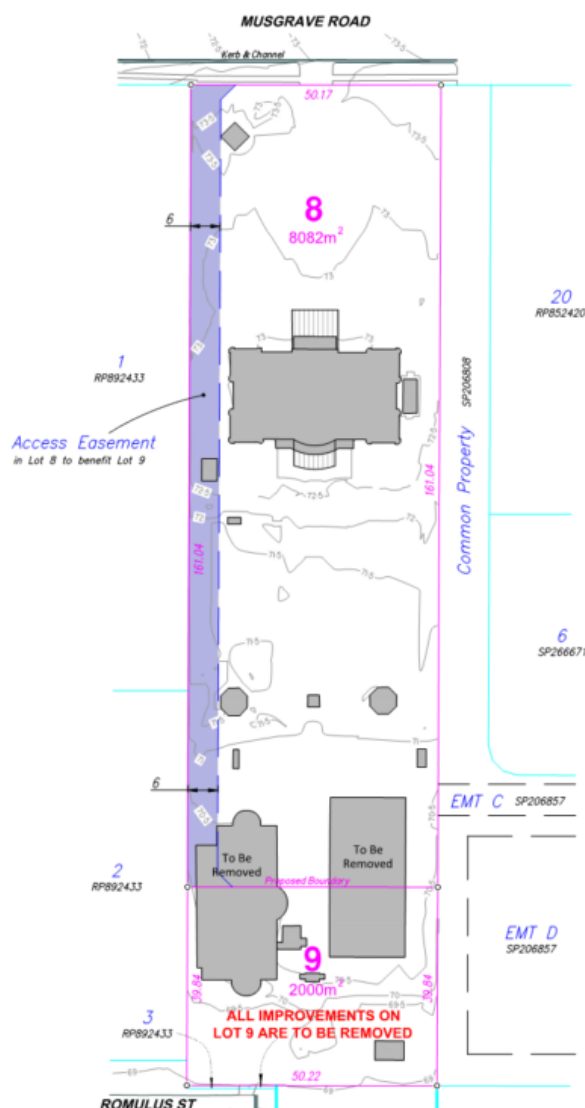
Proposed Subdivision Layout (Source: Lawson Surveys)
